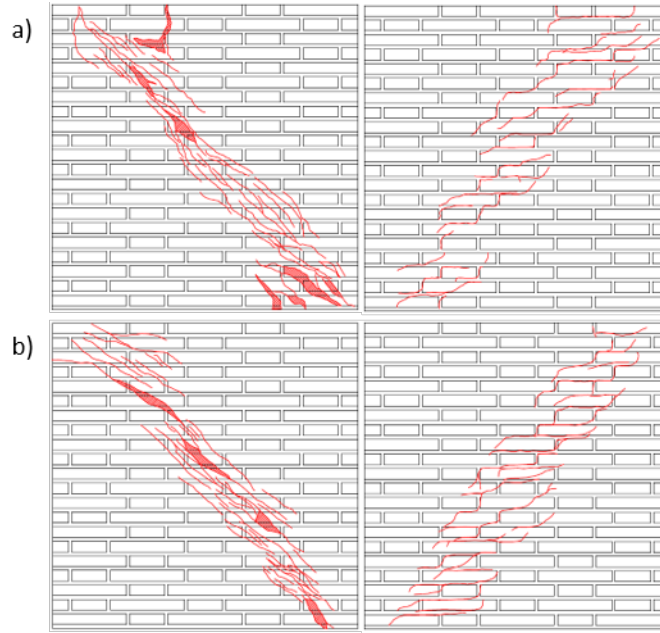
Crack patterns of specimens retrofitted with Basalt TRM in one side (left) and joint repointing in the other side (right): a) LDB-JR.1, b) LDB-JR.2
